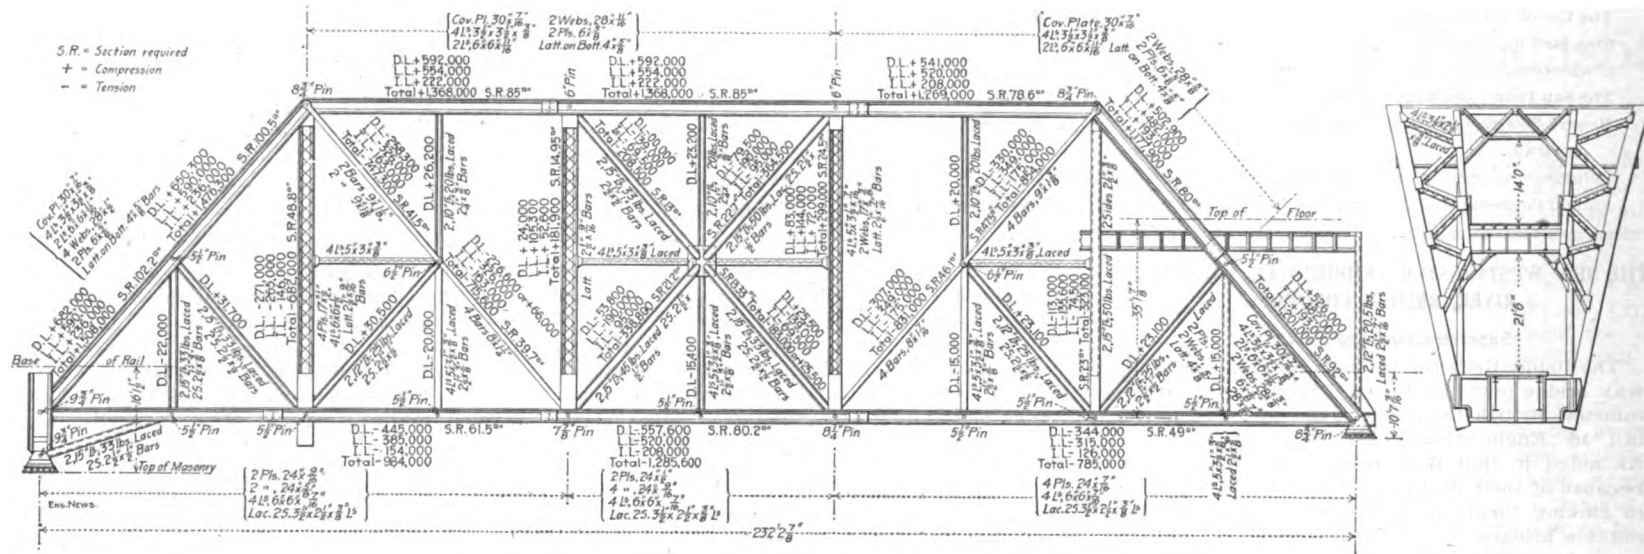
DETAILS OF SPREAD SPAN TRUSS, FRASER RIVER BRIDGE.
